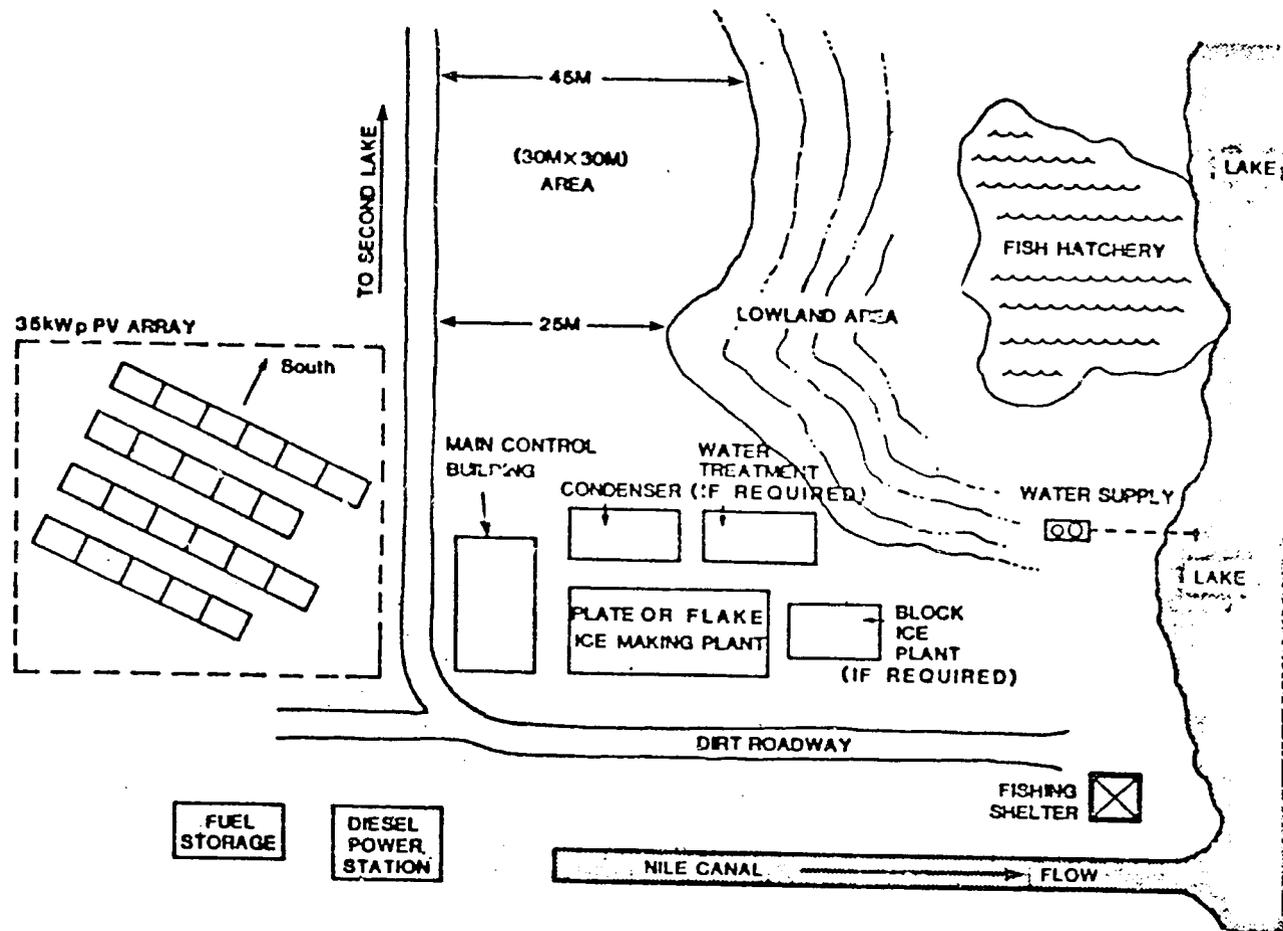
SITE EQUIPMENT LAYOUT
